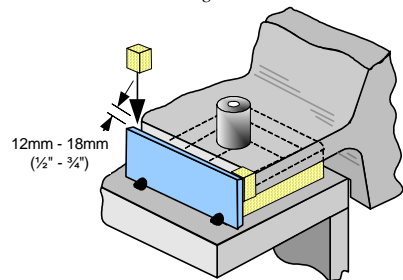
Tack-Weld Front Dam & Insert Overpour Foam Damming at Each End
